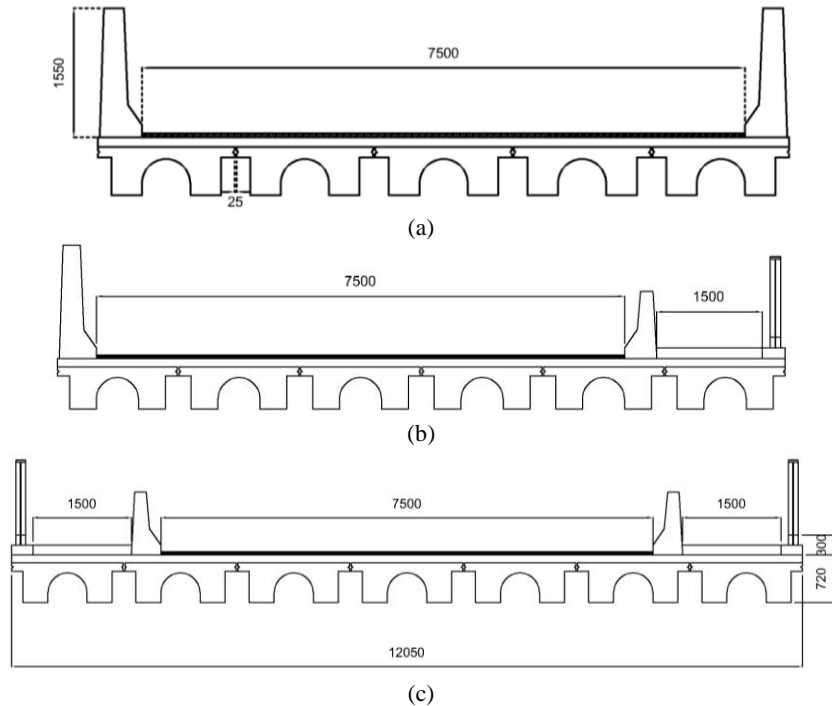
Typical arrangement of (a) five girder assembly (b) six girder assembly with one side footpath (c) seven girder assembly with footpaths on both sides.
